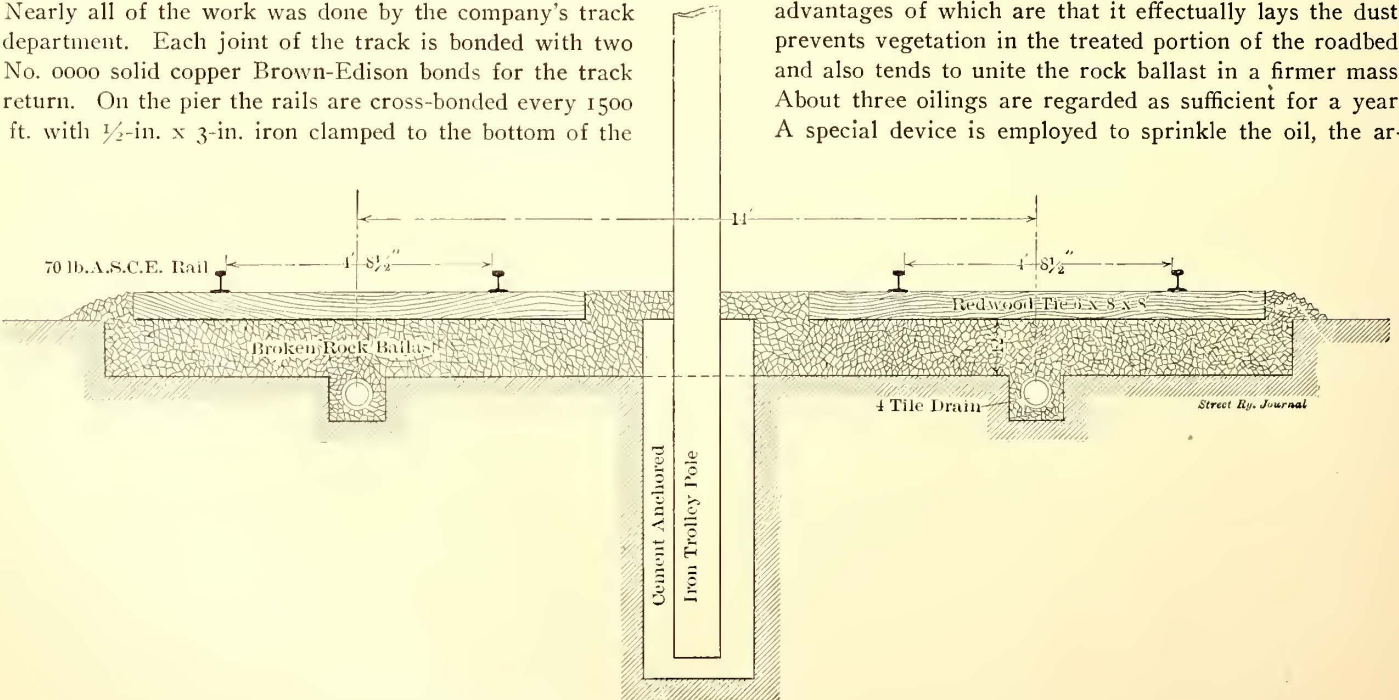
SECTION SHOWING TRACK CONSTRUCTION AND POLE SETTING
